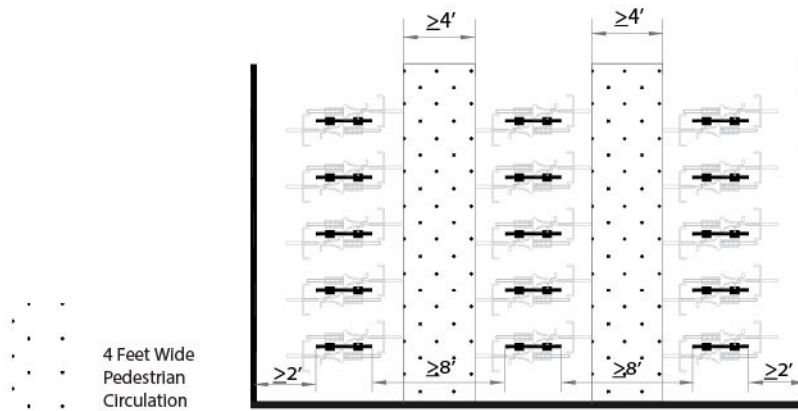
Access and Design Standards for Off Street Bicycle Parking
